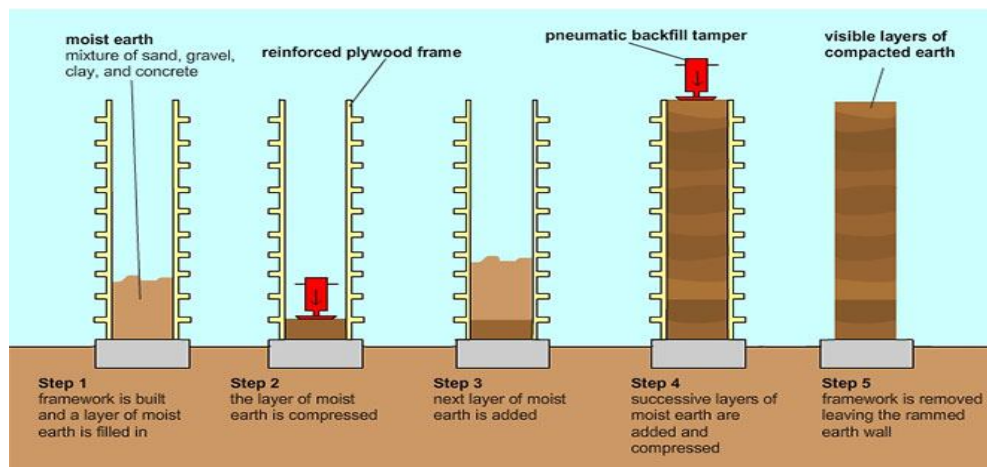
Construction steps of rammed earth structure (www.courtesydiagram.com)
